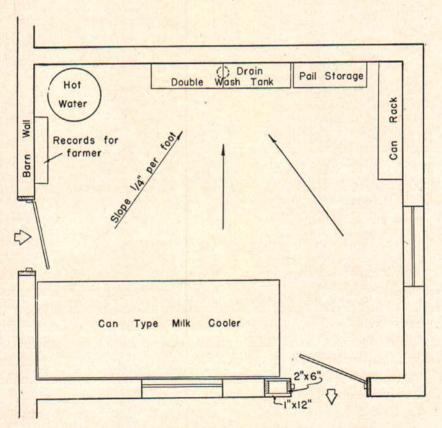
Suggested layout for milkhouses with doors on adjoining sides, equipped with can-type coolers. (See Table 1 for dimensions.)
